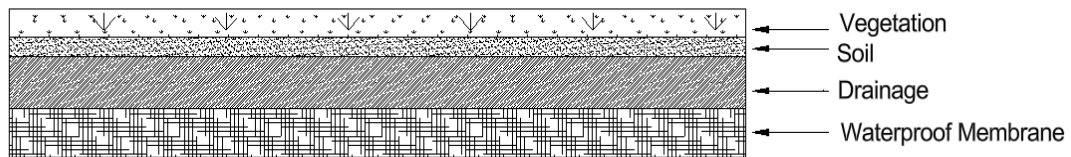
The Construction Design for the Montpetit Hall Green Roof
